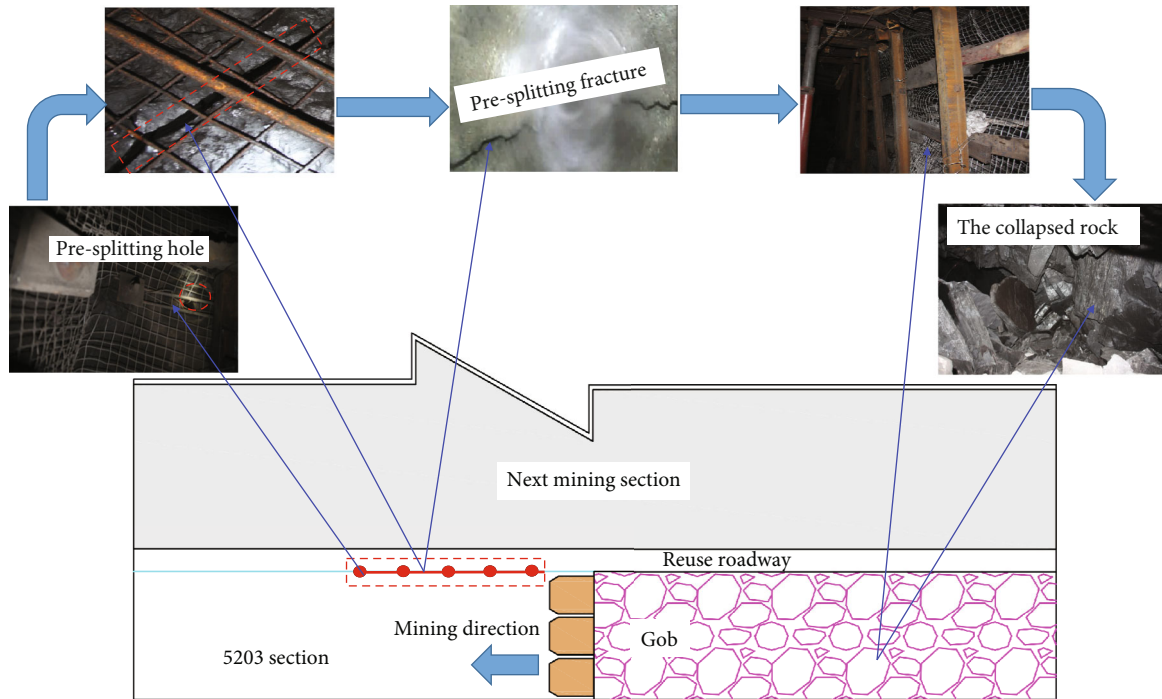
Expansion and penetration field test of roof presplitting fractures.
